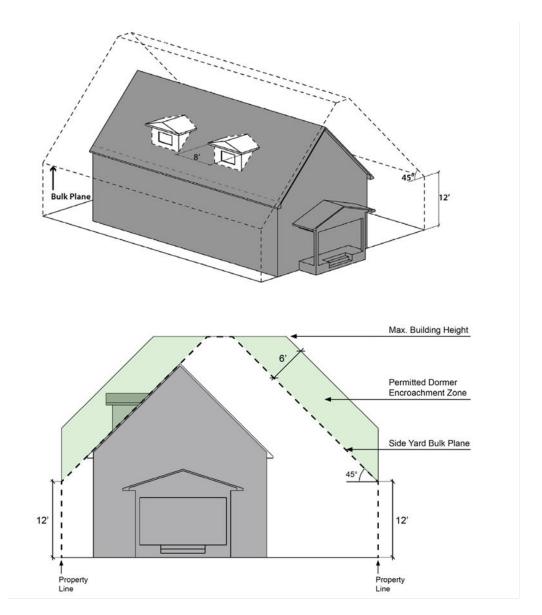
Dormer Encroachment beyond the Side Yard Bulk Plane
